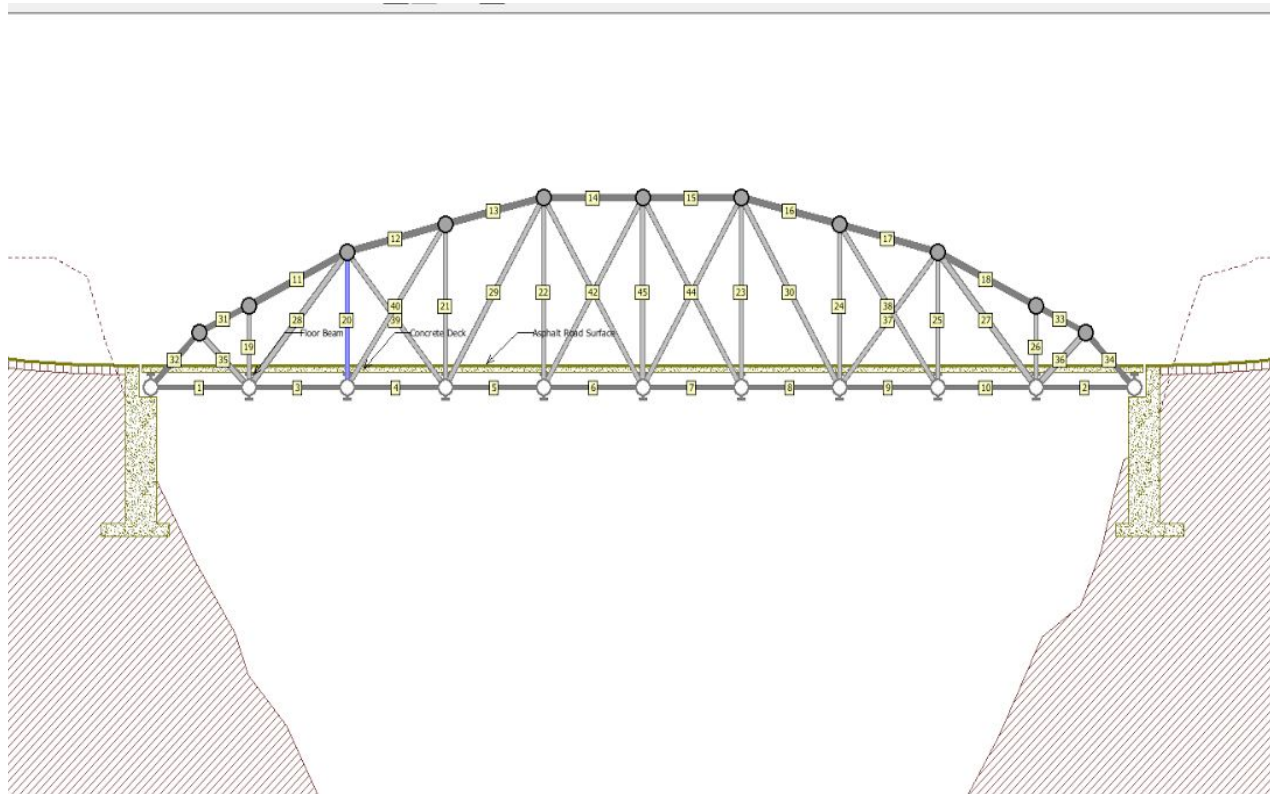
WPBD 2013 Image of the Warren Truss Bridge Design
